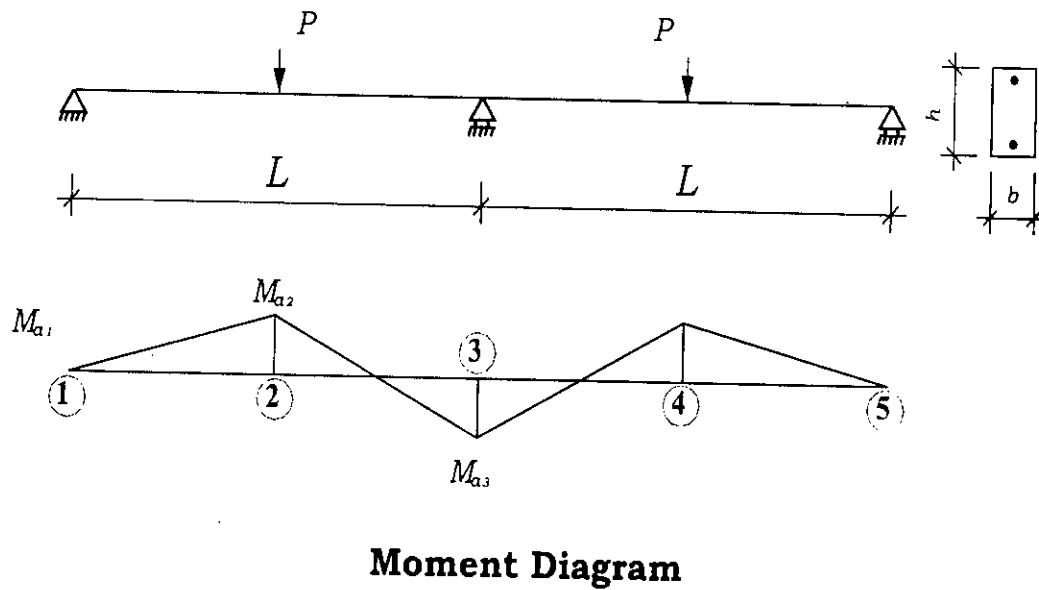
Deflection of a reinforced concrete two-span beam.
